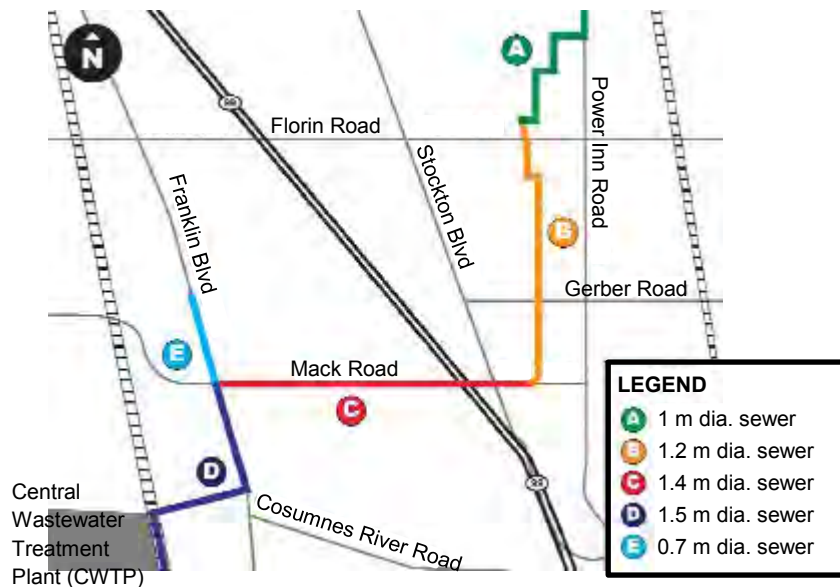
Layout of the Central Trunk Concrete Sewer (McWilliams and Parmer, 2010).
